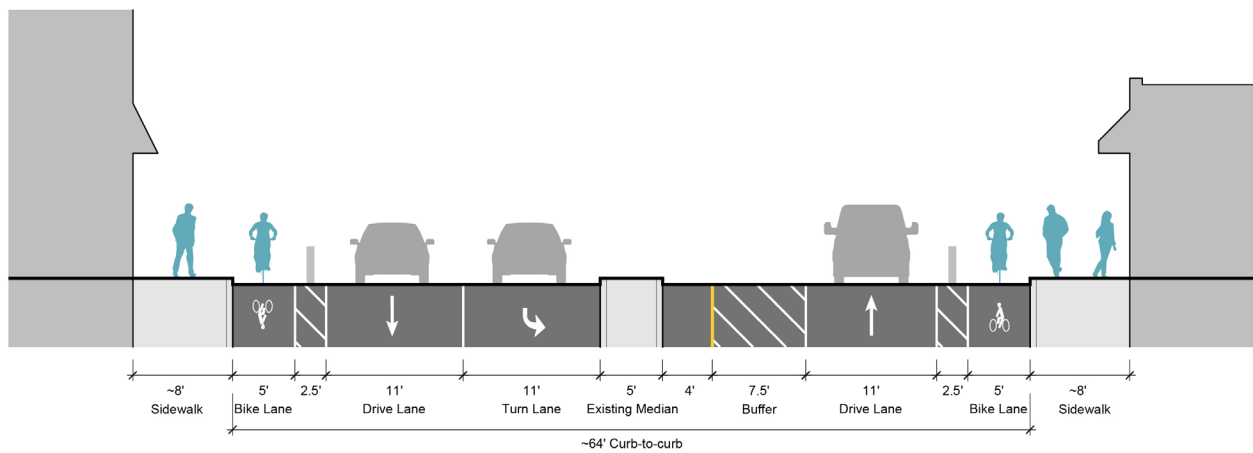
Dorchester Street and Old Colony Intersection Short-Term Improvements - Typical Section
